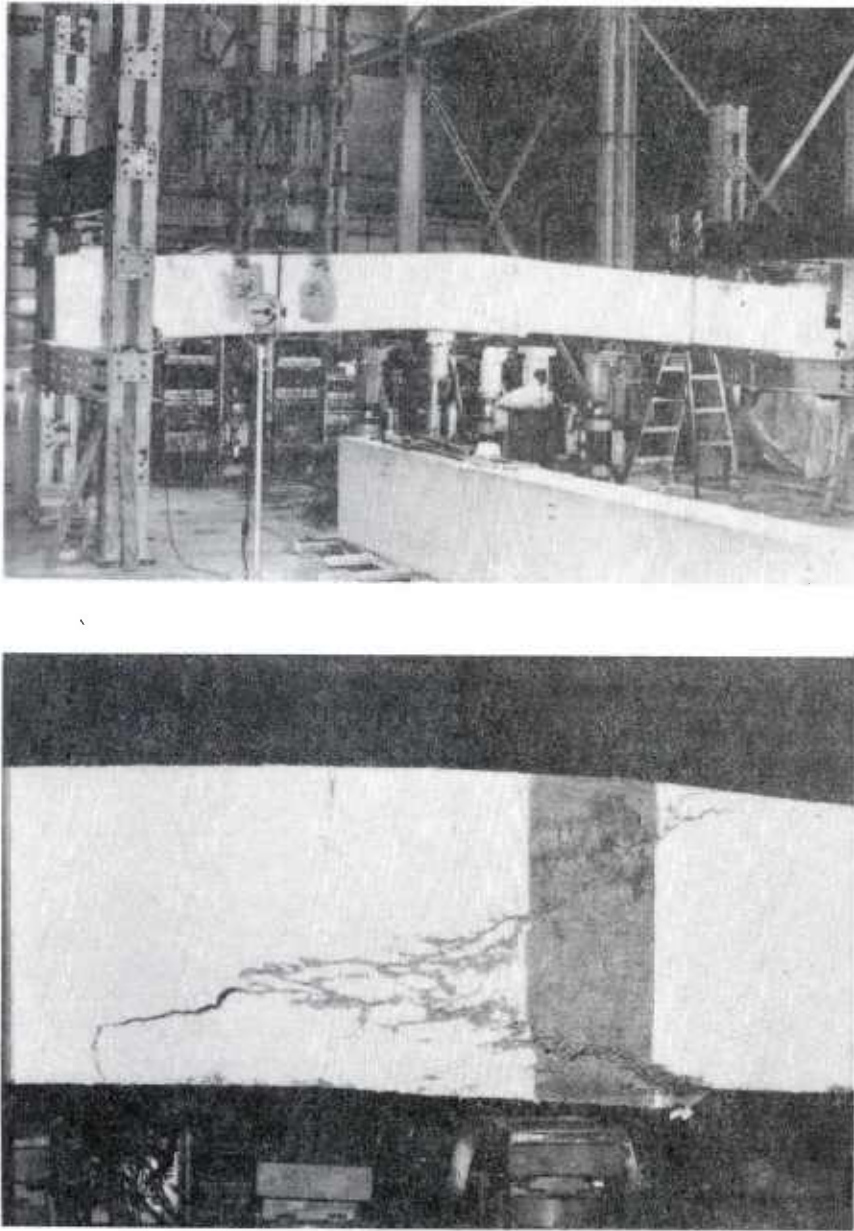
Top - Overall View of Beam No. 5 at Failure
